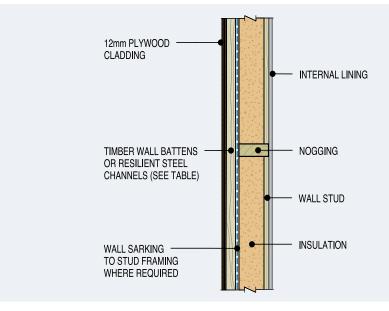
12 mm Plywood cladding over Fibre Cement. Vertical section through wall
